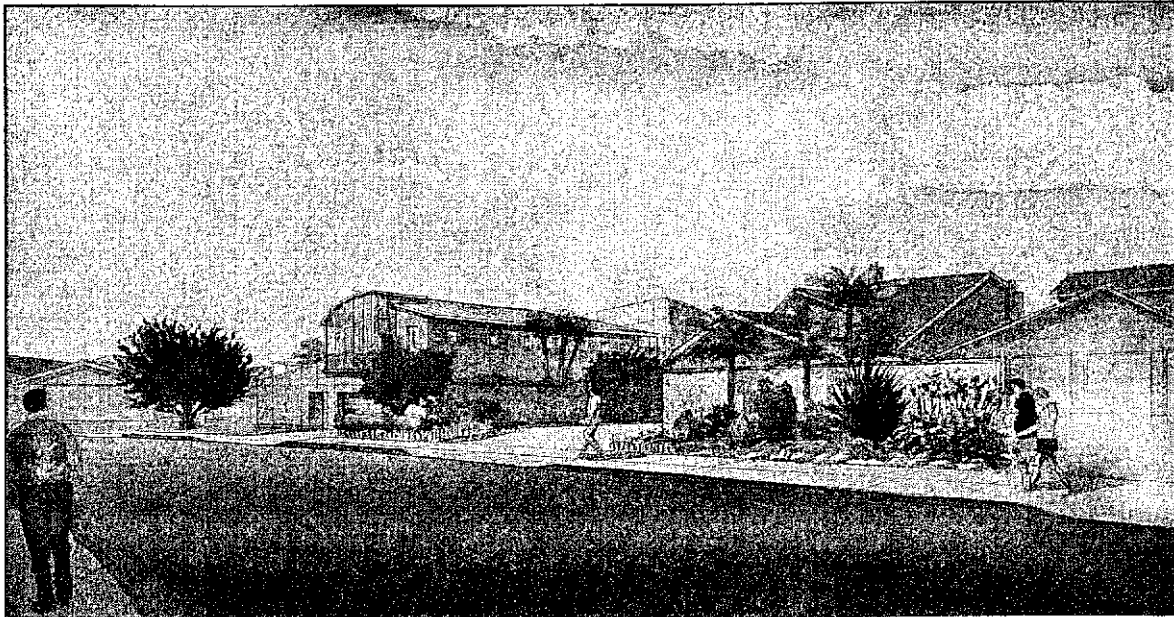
Proposed Porter House, north and west elevations. *Watercolor by Robert Becker.
